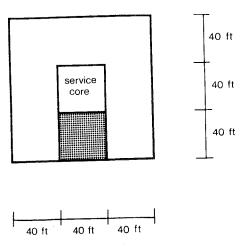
Plan of typical floor of building for which the floor-ceiling sandwich is to be designed.
